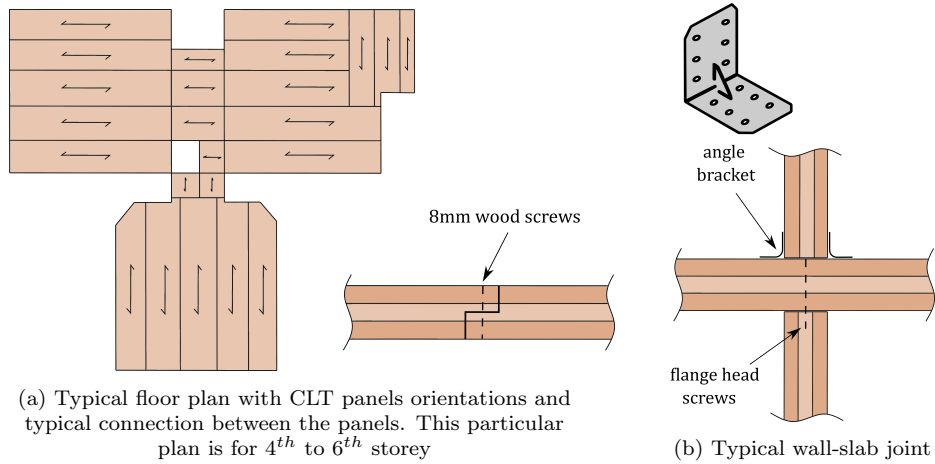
Key structural details of the Yoker CLT building (after [8]).
